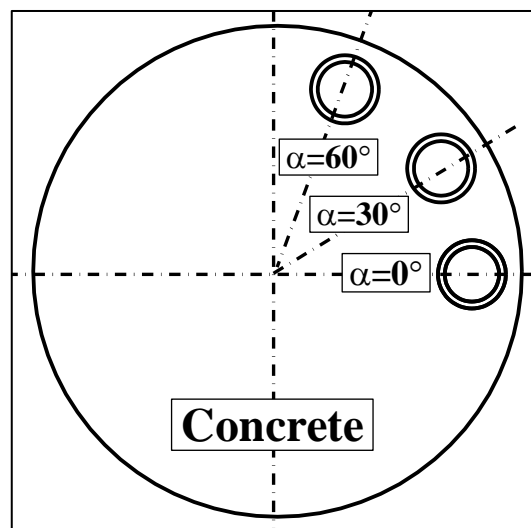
3. Angular configurations of pipe placement within the concrete cross-section.
